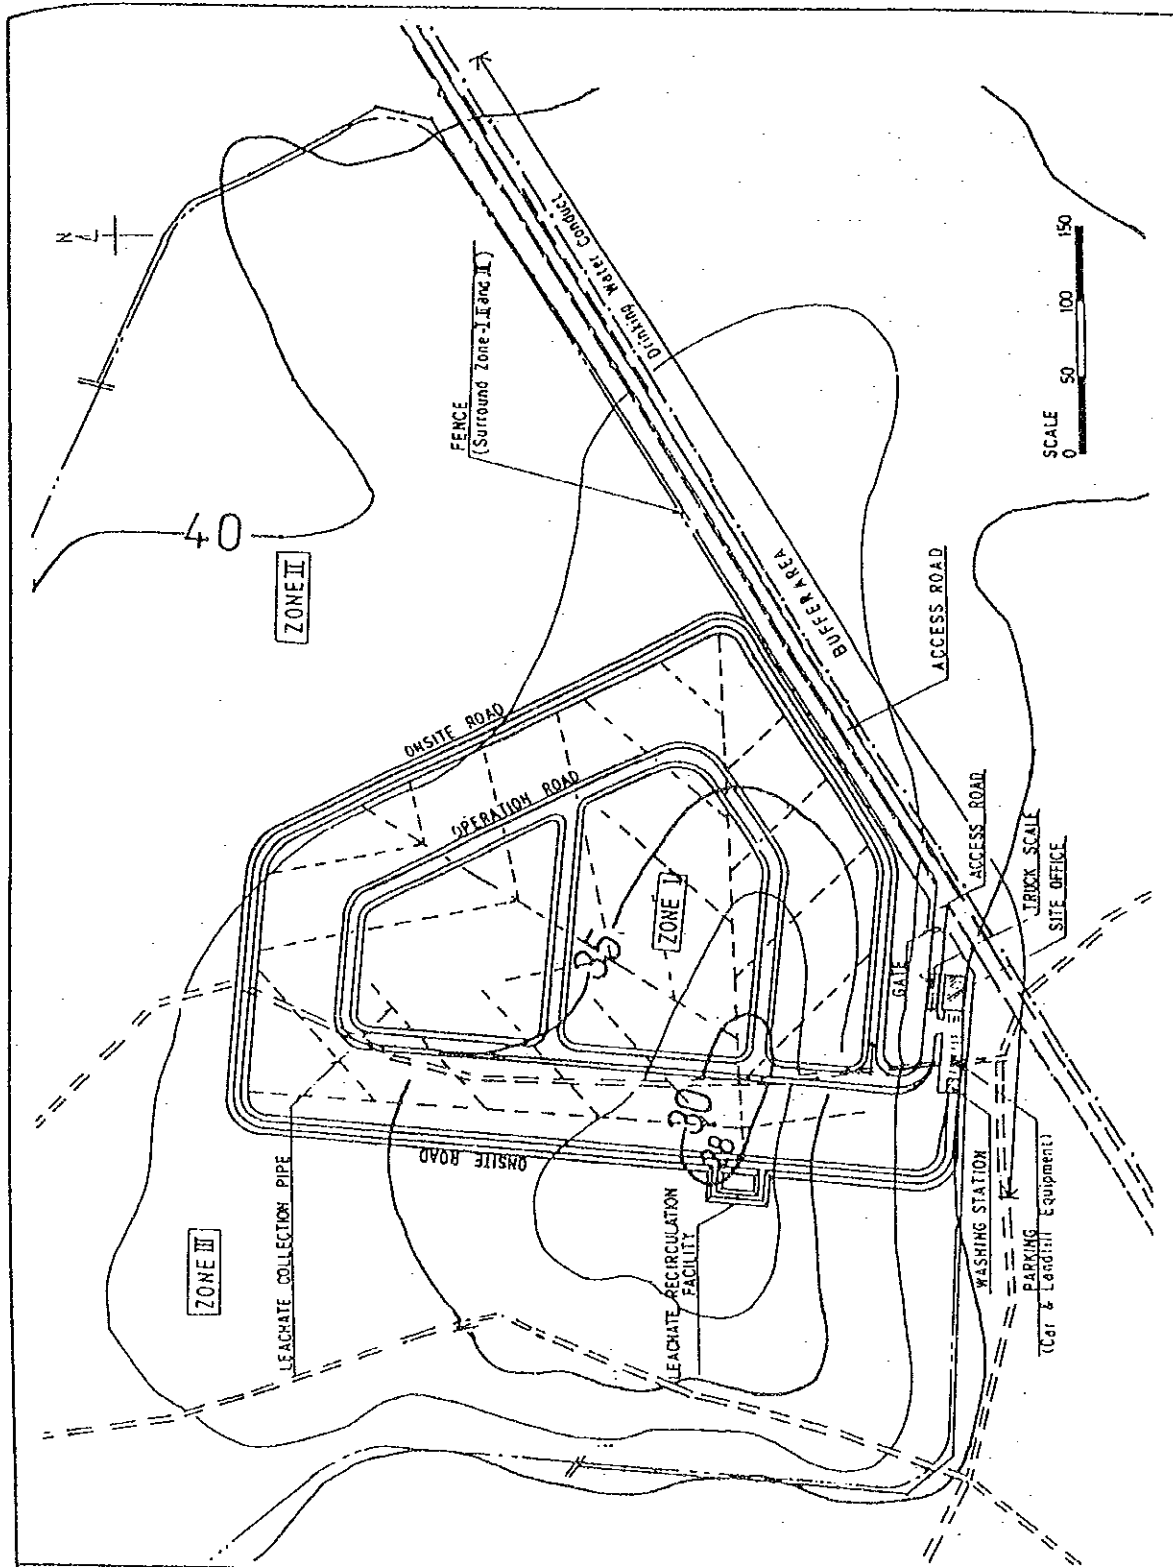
Facility Plan of Bettoua Disposal Site (Zone I)
